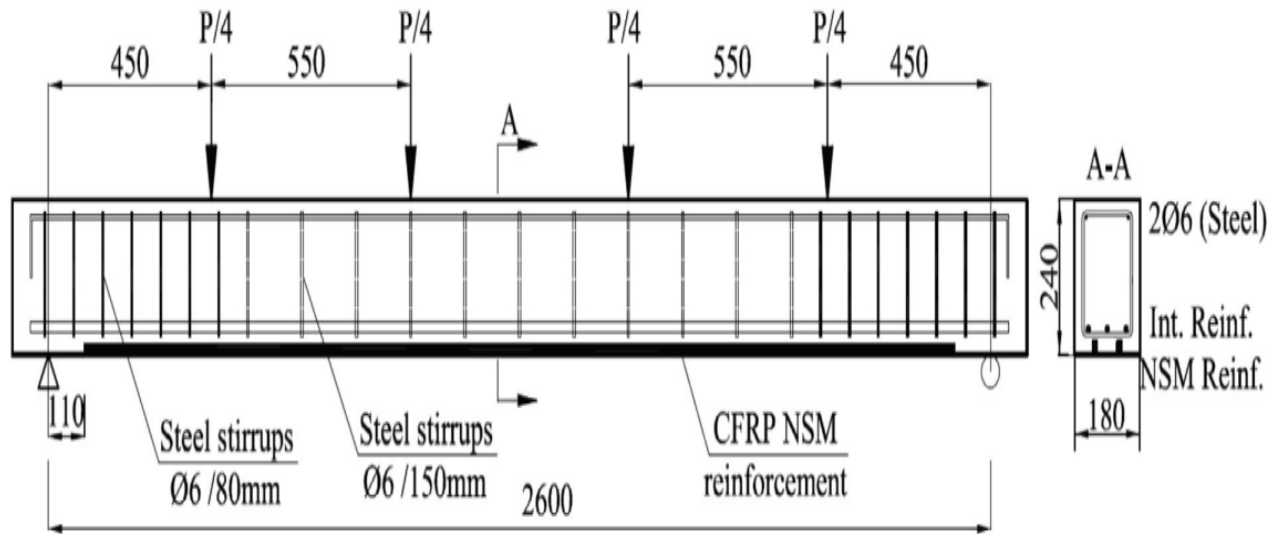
Cross-section of beams (dimensions are in mm) (Lin and Zhang, 2013)
